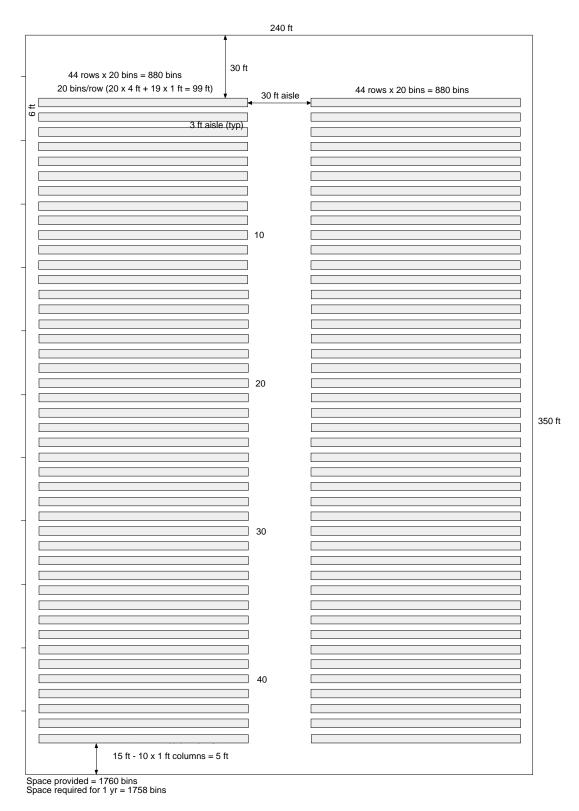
U3O8 Storage Building Plan Conversion to U3O8 and AHF (25 yr)
